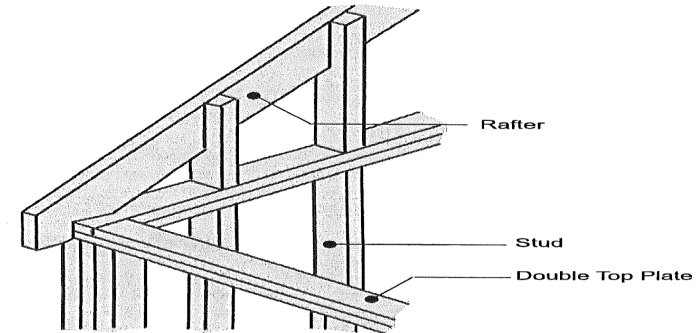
Exterior Wall Framing at Gable End Detail
